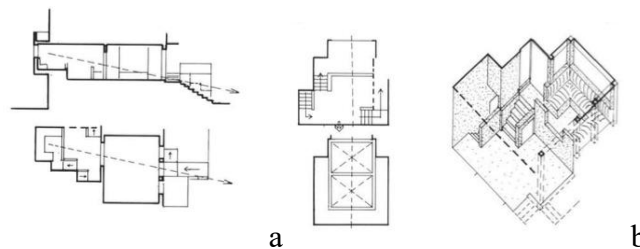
a) Raum Plan, Adolf Loos, Moller house, Vienna, b) Raum Plan \_Moller House Adolf Loos
